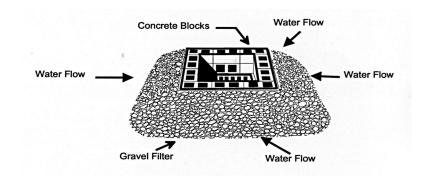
Typical Block and Gravel Drop Inlet Protection
